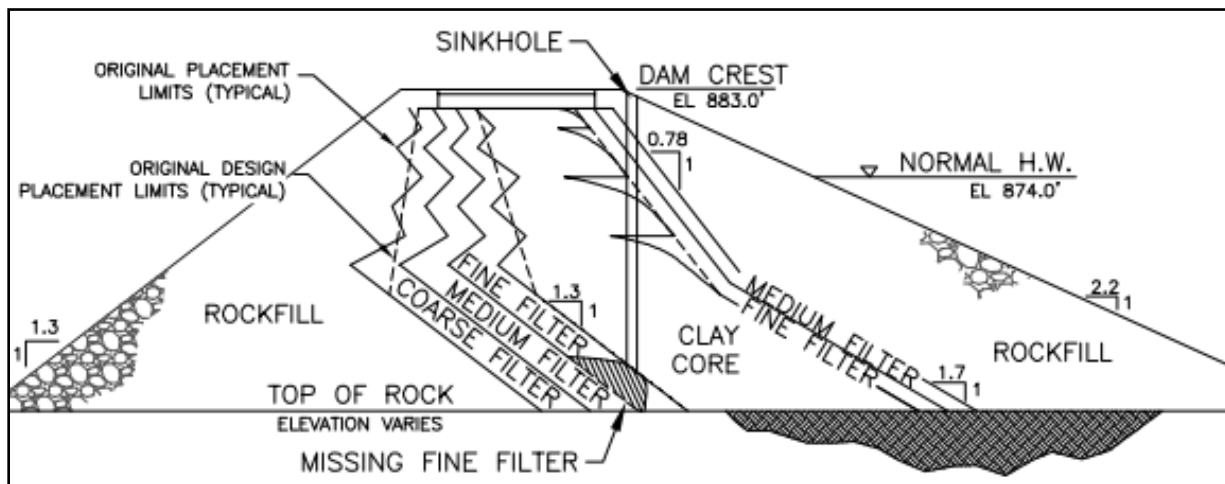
Cross section of the original embankment construction showing sinkhole and missing fine filter. Note the “Herringbone” pattern of the downstream filters; original construction placement techniques caused the as-built filter locations (solid line) to deviate from the design placement limits (dashed line).
